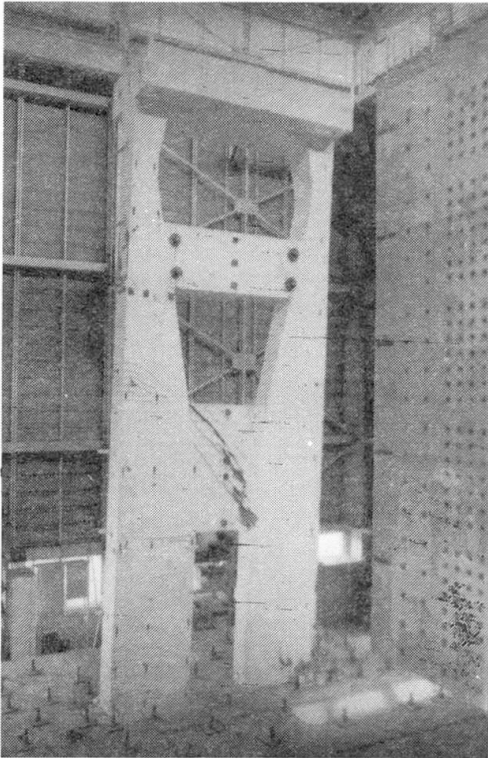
1/10 Model Test in Direction at Right Angles to Bridge Axis
